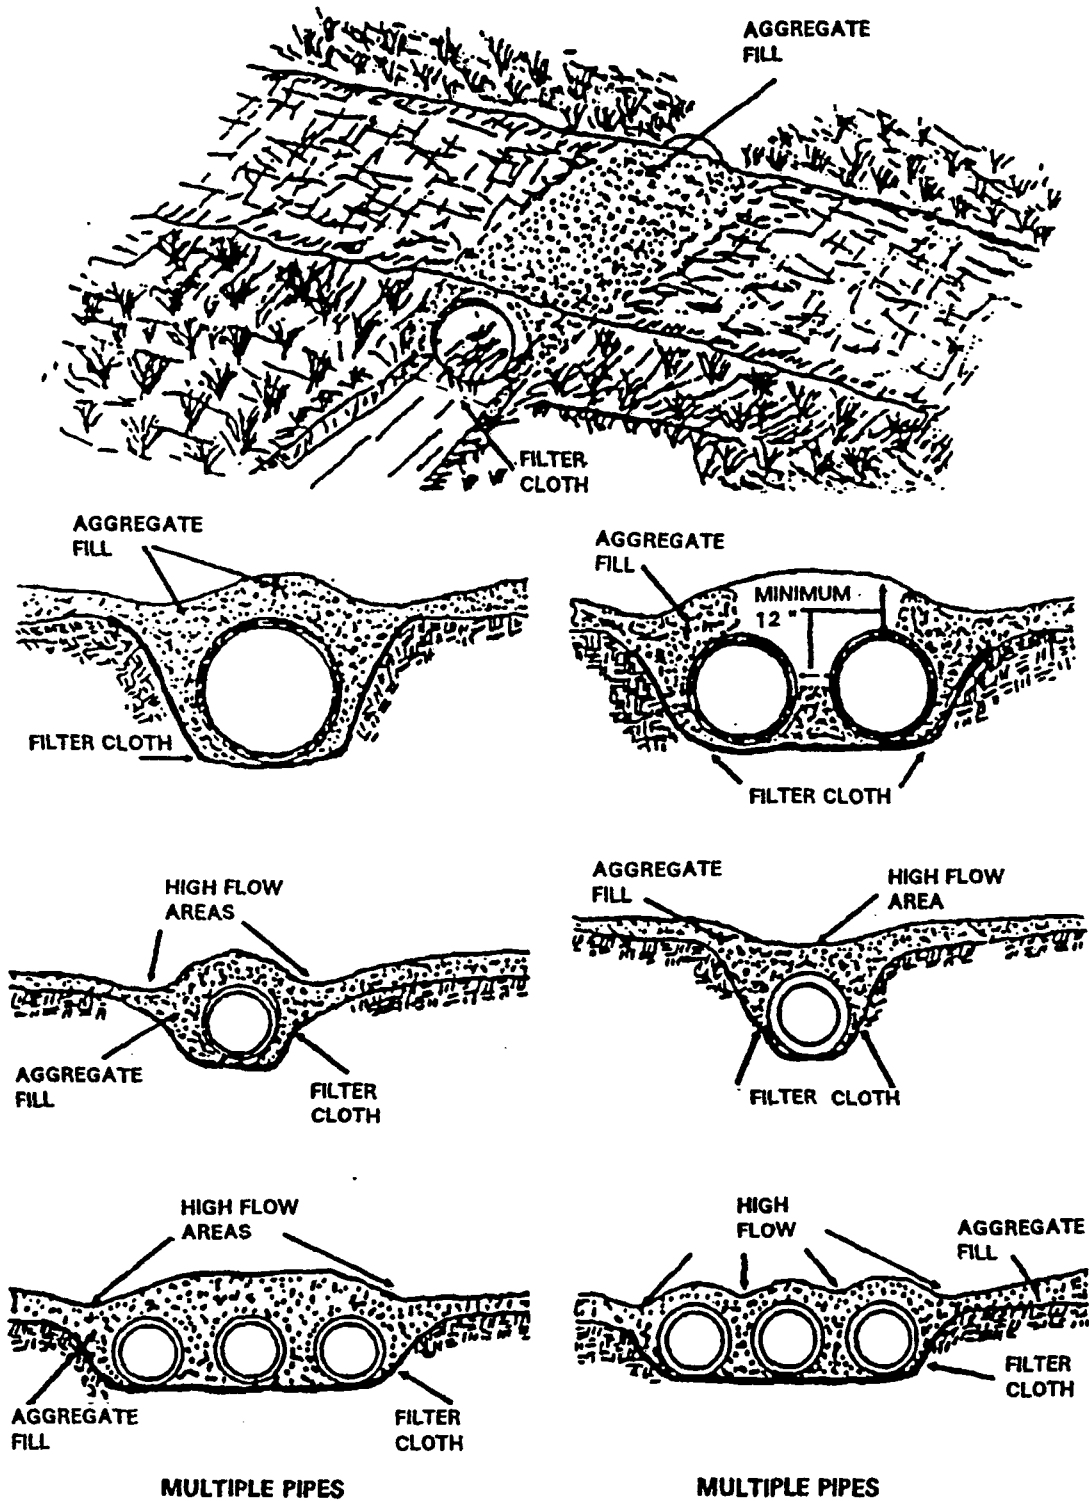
TEMPORARY ACCESS CULVERT
